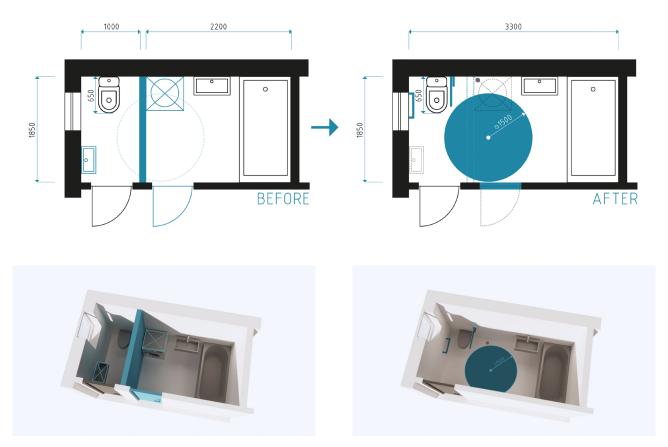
a, b, c, d Accessible bathroom is achieved by removing the wall between the bathroom and the toilet. No plumbing and pipe fittings can be installed on the removable wall. The bathroom floor must be sloping into the floor drain (Rollová, Suláková)
